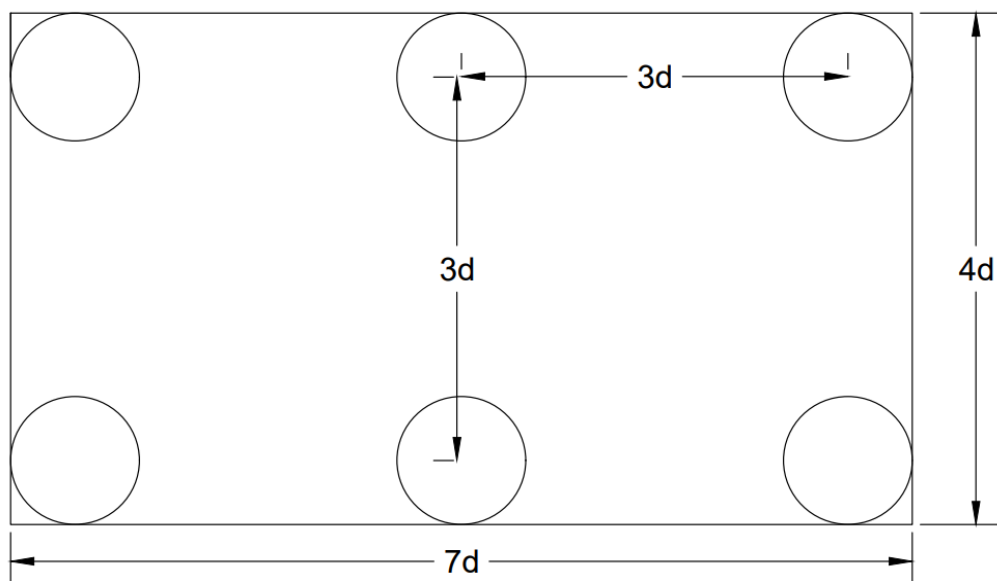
6 pile arrangement with 28 sqm. Raft size
